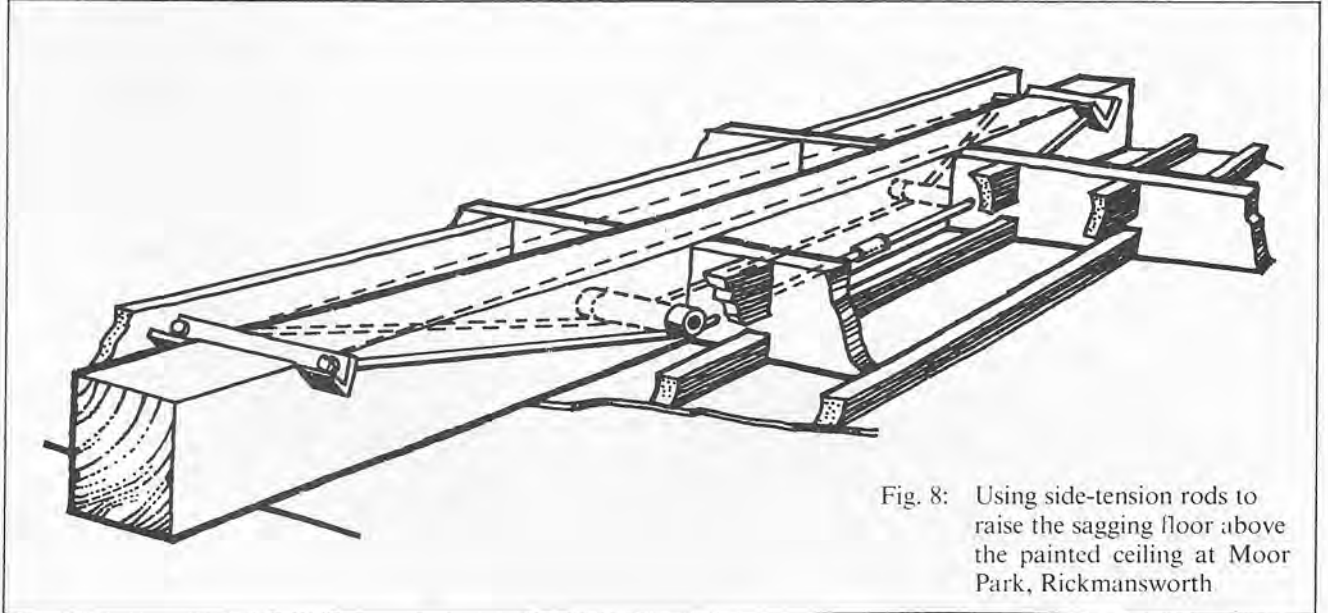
Using side-tension rods to raise the sagging floor above the painted ceiling at Moor Park, Rickmansworth
